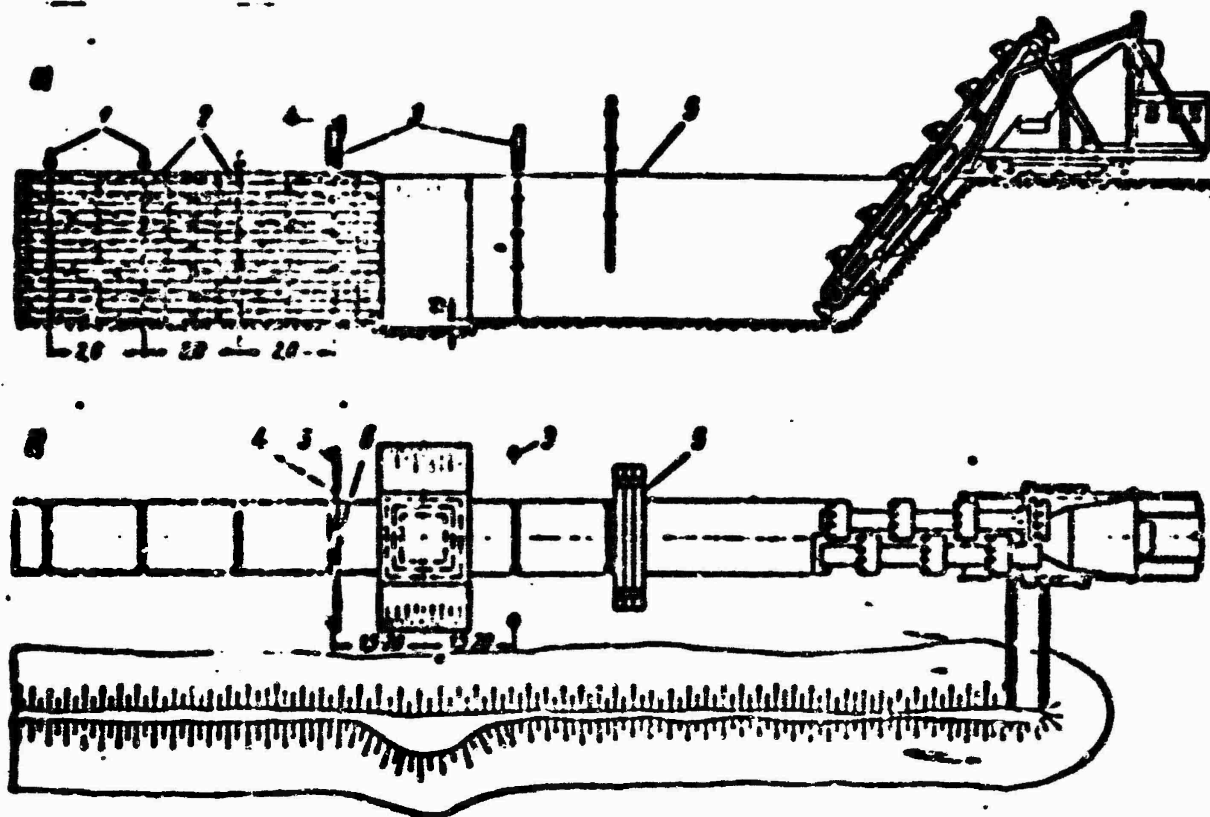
Digging trenches by the ETN-351 multibucket excavator. a) Section along the trench axis; b) plan view of the trench. 1) Sliding ladders; 2) board shields; 3) sight rail pole; 4) sight rail barrier; 5) shield placed for placing of ladder-type braces; 6) shelf-girder.
